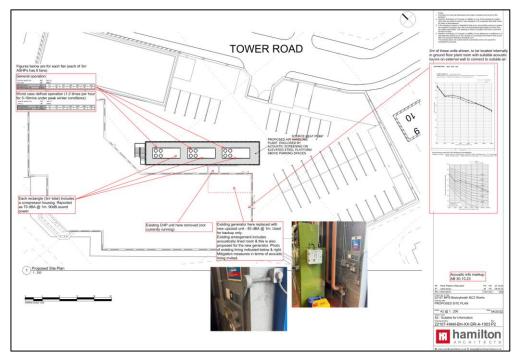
Scale drawings showing the location of the proposed plant deck and additional back-up plant
